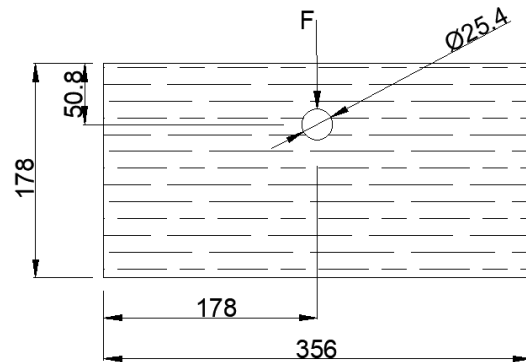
Perpendicular to the grain specimen designed to fail in Mode I (dimensions in mm)
